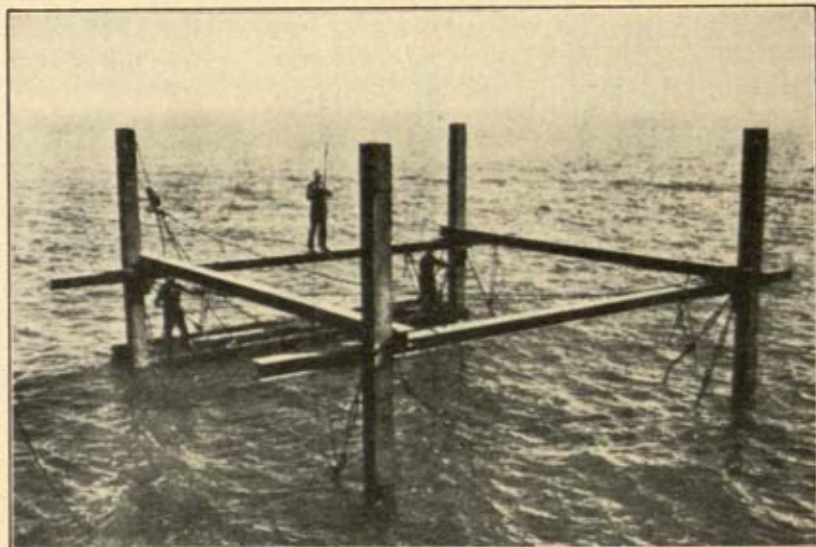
e. Successive steps in constructing the cells for a circular-type cofferdam. (Guy F. Atchison Co.) (a) H piles are driven in square and braced with struts and supports.
